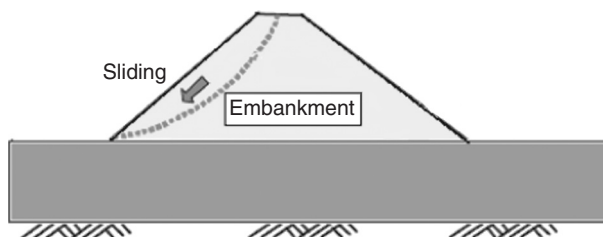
Sliding of dam slope at the end of construction (modified from [5]).
